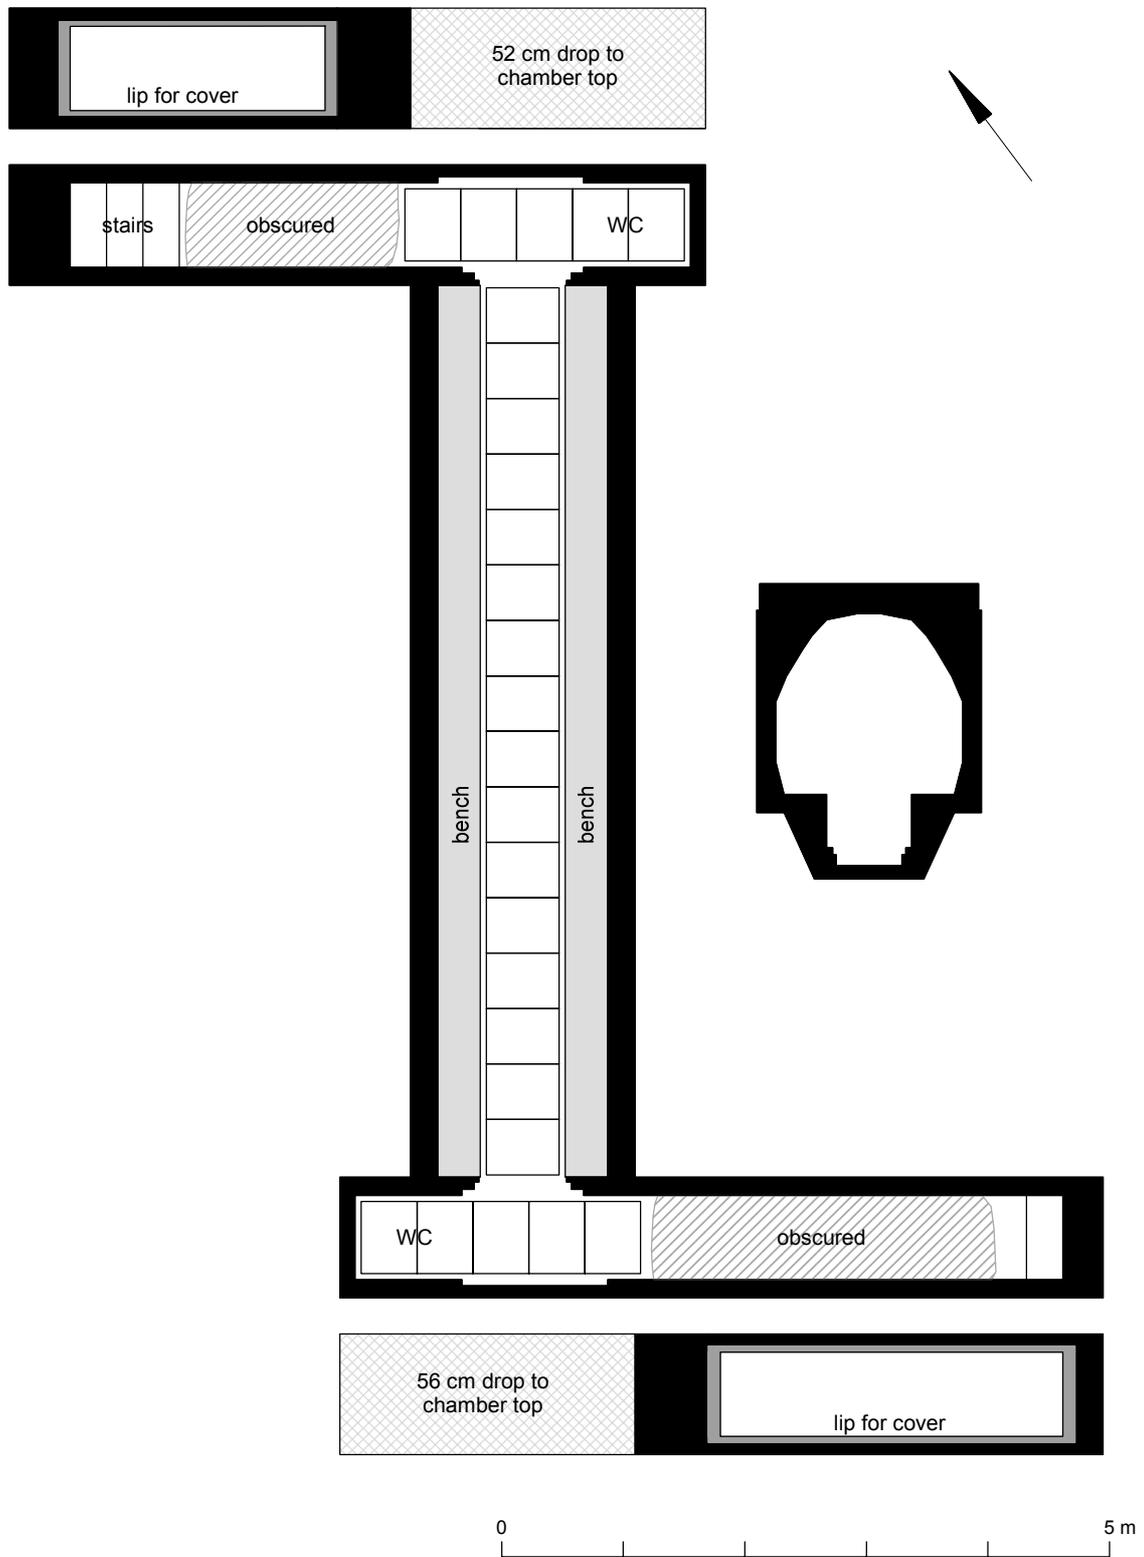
Area J1, air-raid shelter F7: internal plan and cross-section of chamber.
